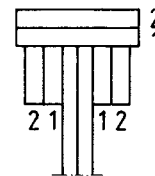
Cross section of a built-up chord of a nailed solid-web beam
